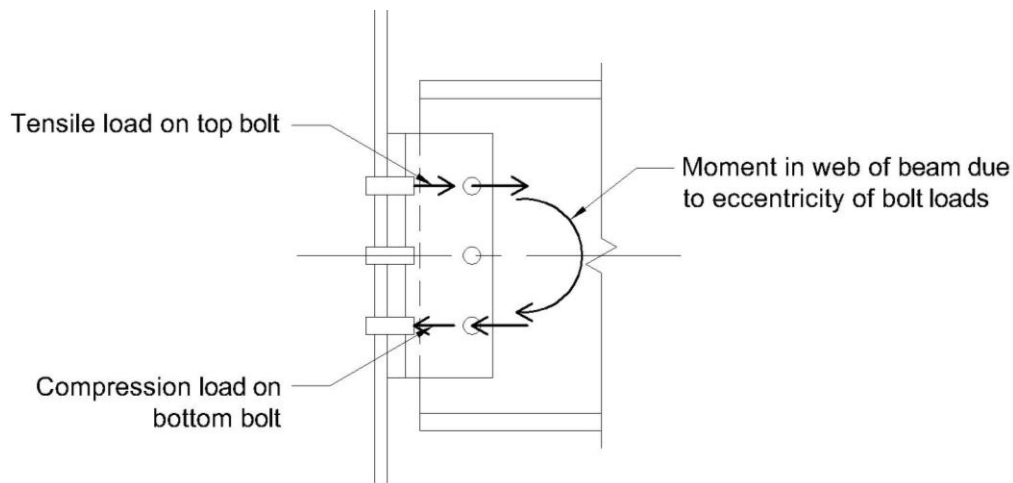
Forces Caused by Eccentricity of Beam-to-Column Connection
